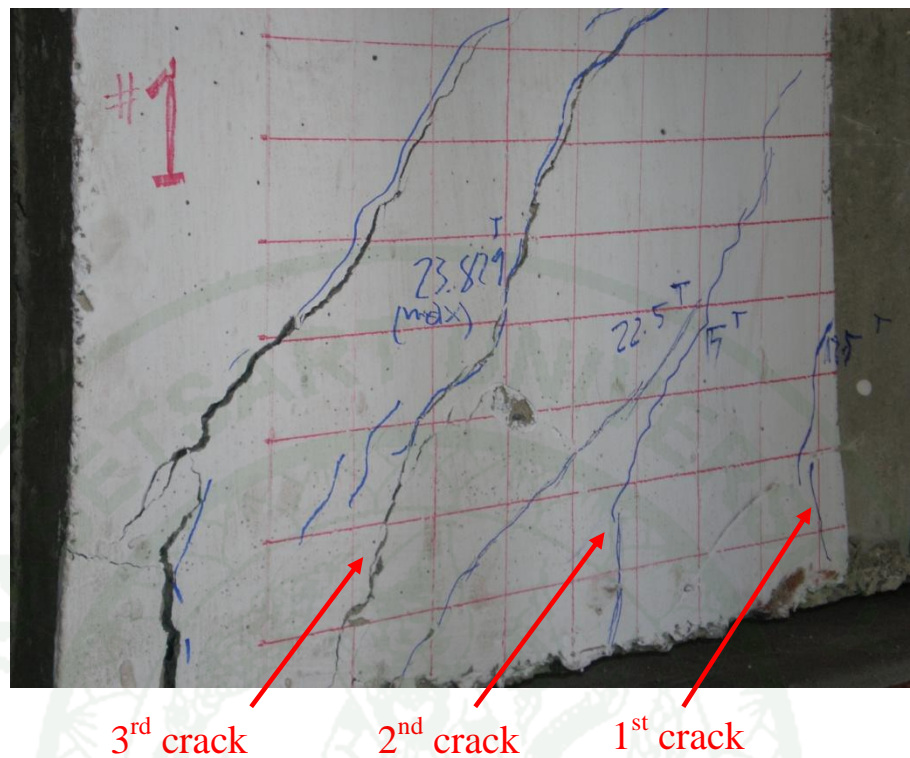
Cracking development of specimen Bartec small head dia 20 mm U-20-240-4.32-B-1/1
